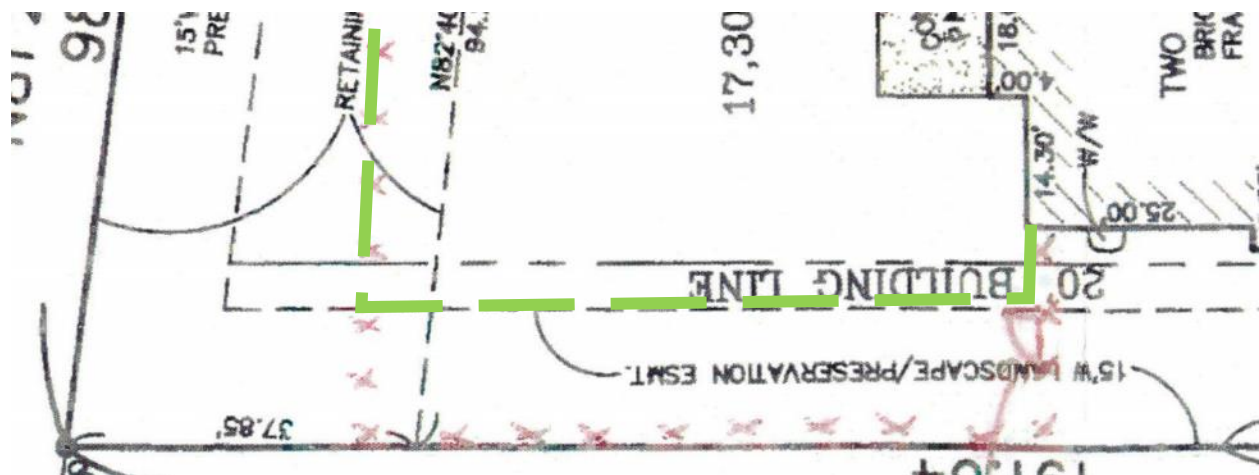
Close-up of the Site Plan with Staff's Recommended 15 foot setback highlighted in green.
